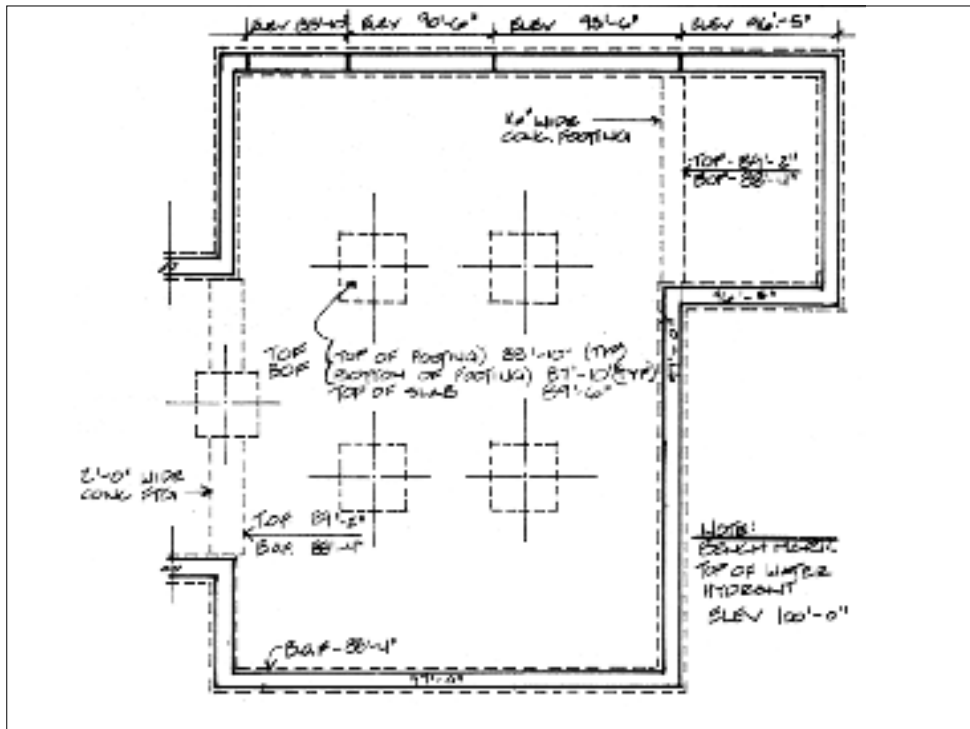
Benchmark method. In this method, all elevations are pre-determined in relation to a fixed point on the site. In this case, the benchmark was a nearby fire hydrant. (This is a portion of a foundation plan for a light-commercial wood-frame building.)
